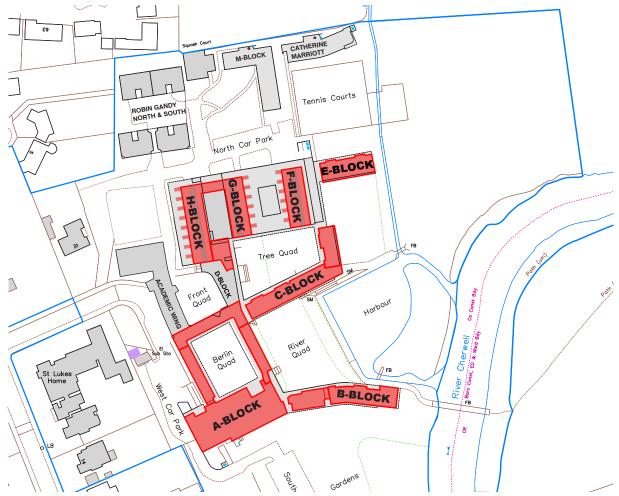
Site plan of Wolfson College - proposed work area shaded in red.
